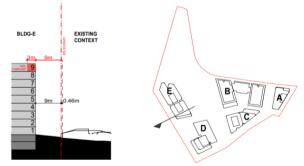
F1.4 Building E boundary condition & Key Plan (NTS) Building E Side Setback 2 (Fig. 3F1.5)
